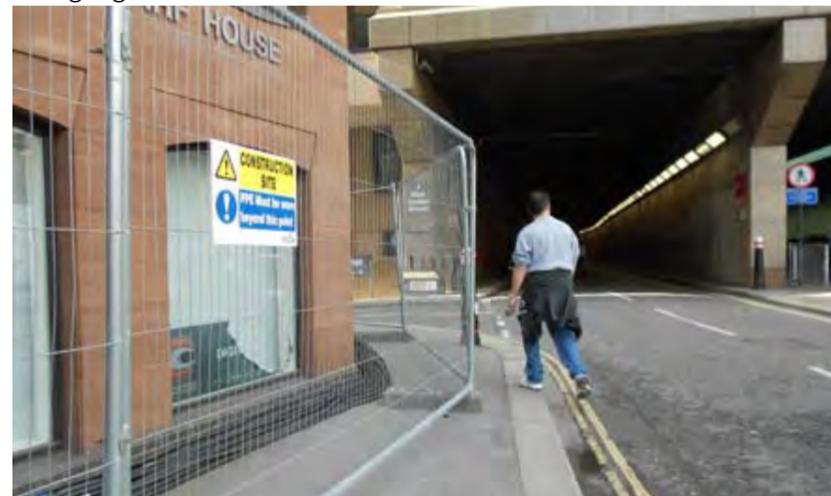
High Timber Street / Broken Wharf corner- pinch point on footway made worse by temporary fencing.
